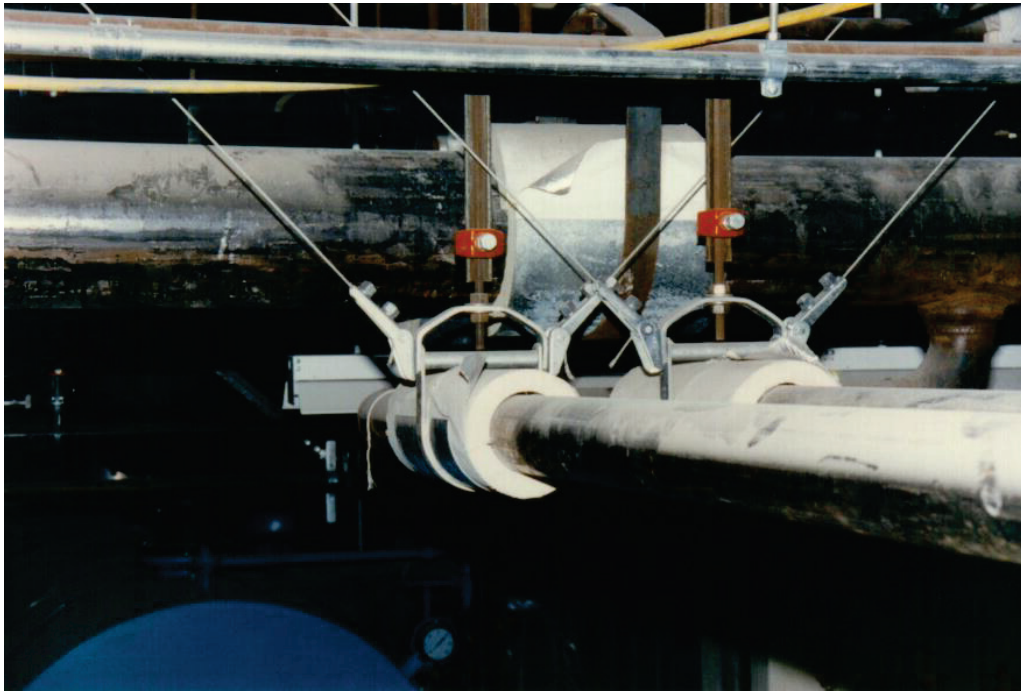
Single clevis hanger support with transverse cable bracing at the restraining bolt (Photo courtesy of Mason Industries).
